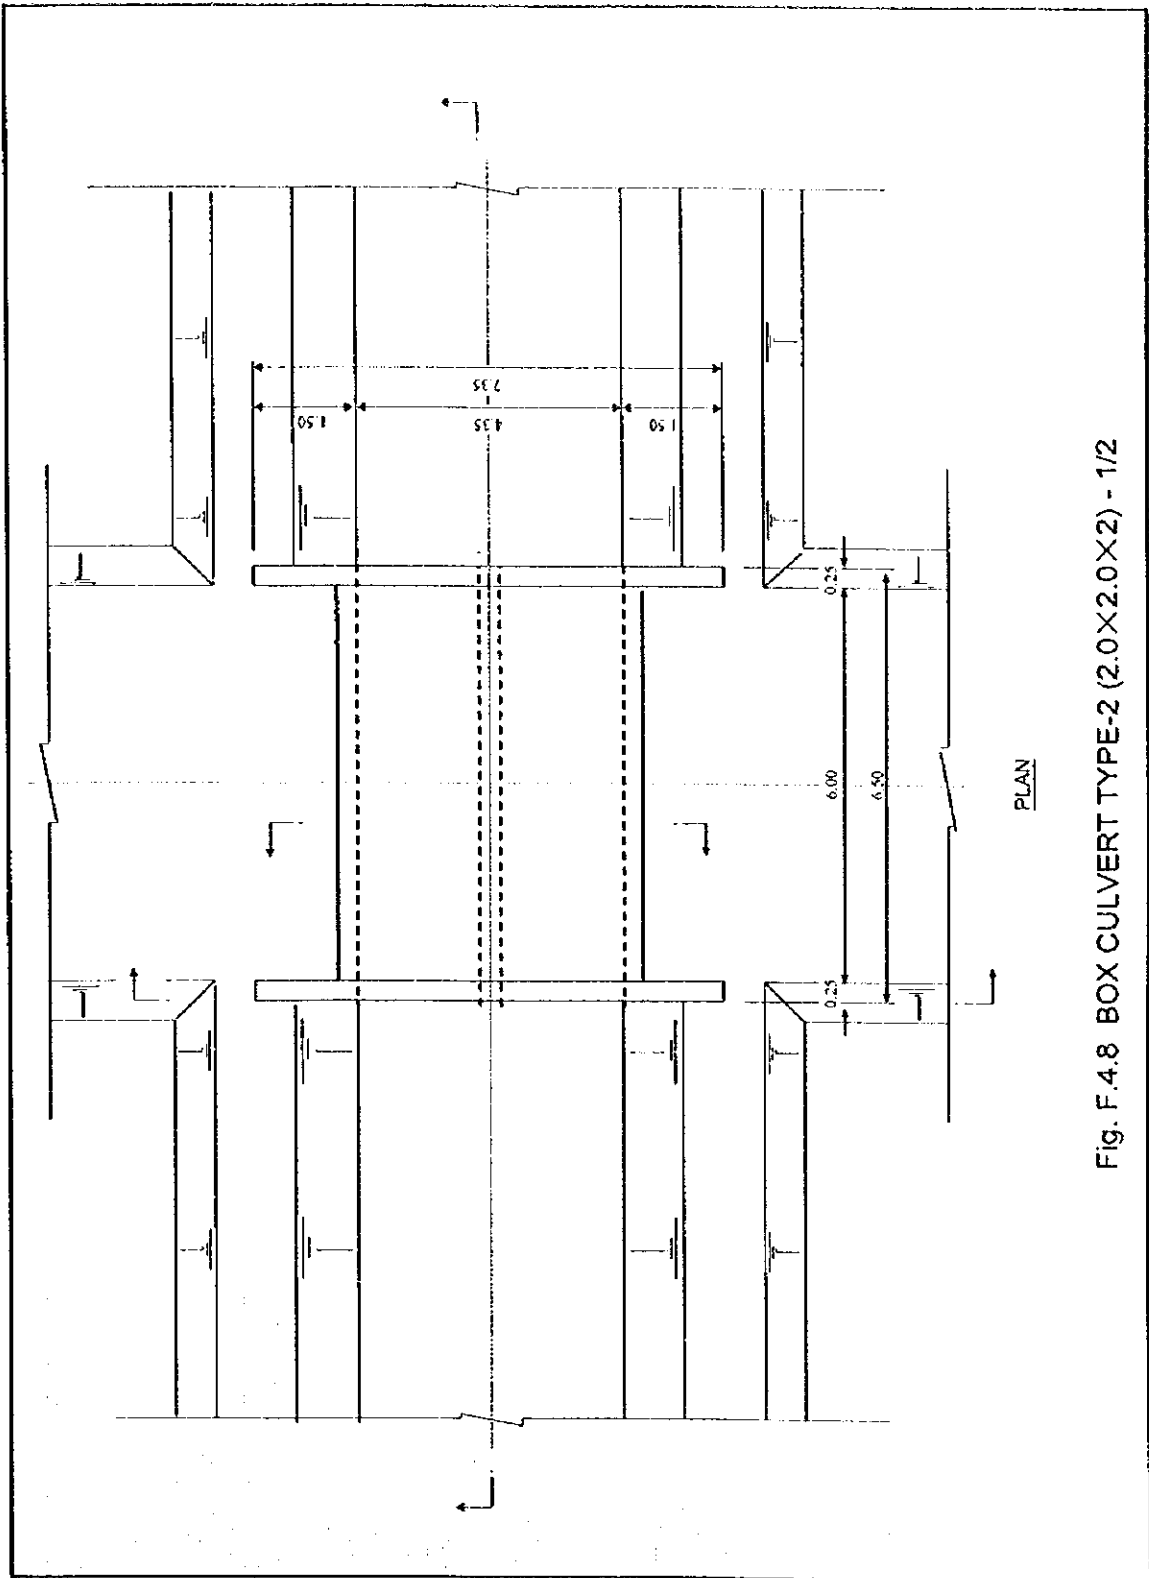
BOX CULVERT TYPE-2 (2.0X2.0X2) - 1/2
